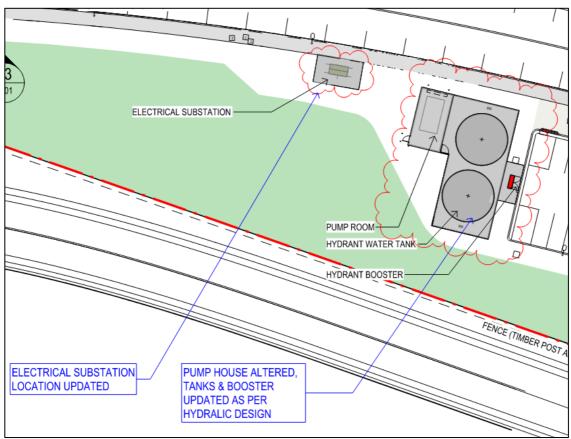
UPDATED SITE INFRASTRUCTURE LAYOUT
